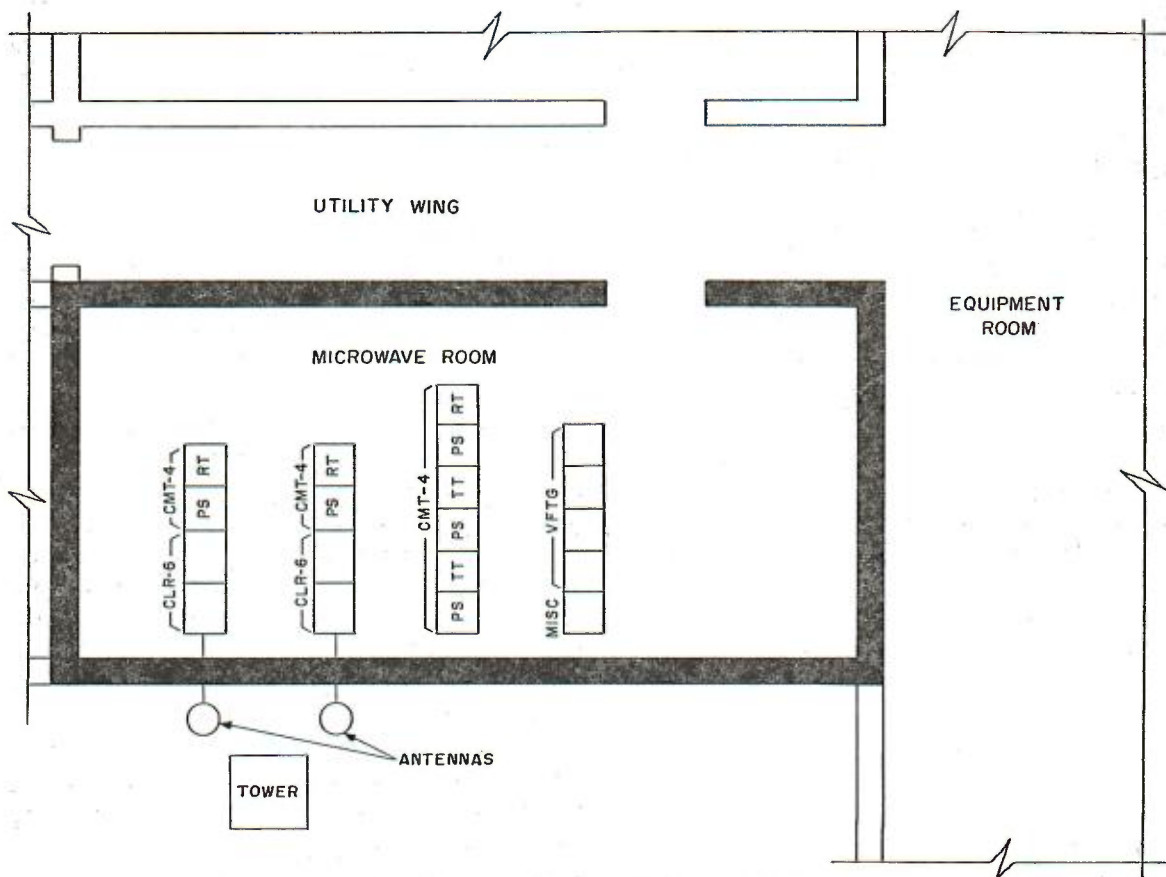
Typical Location of Intersite Facilities at the Transmitter Site.
